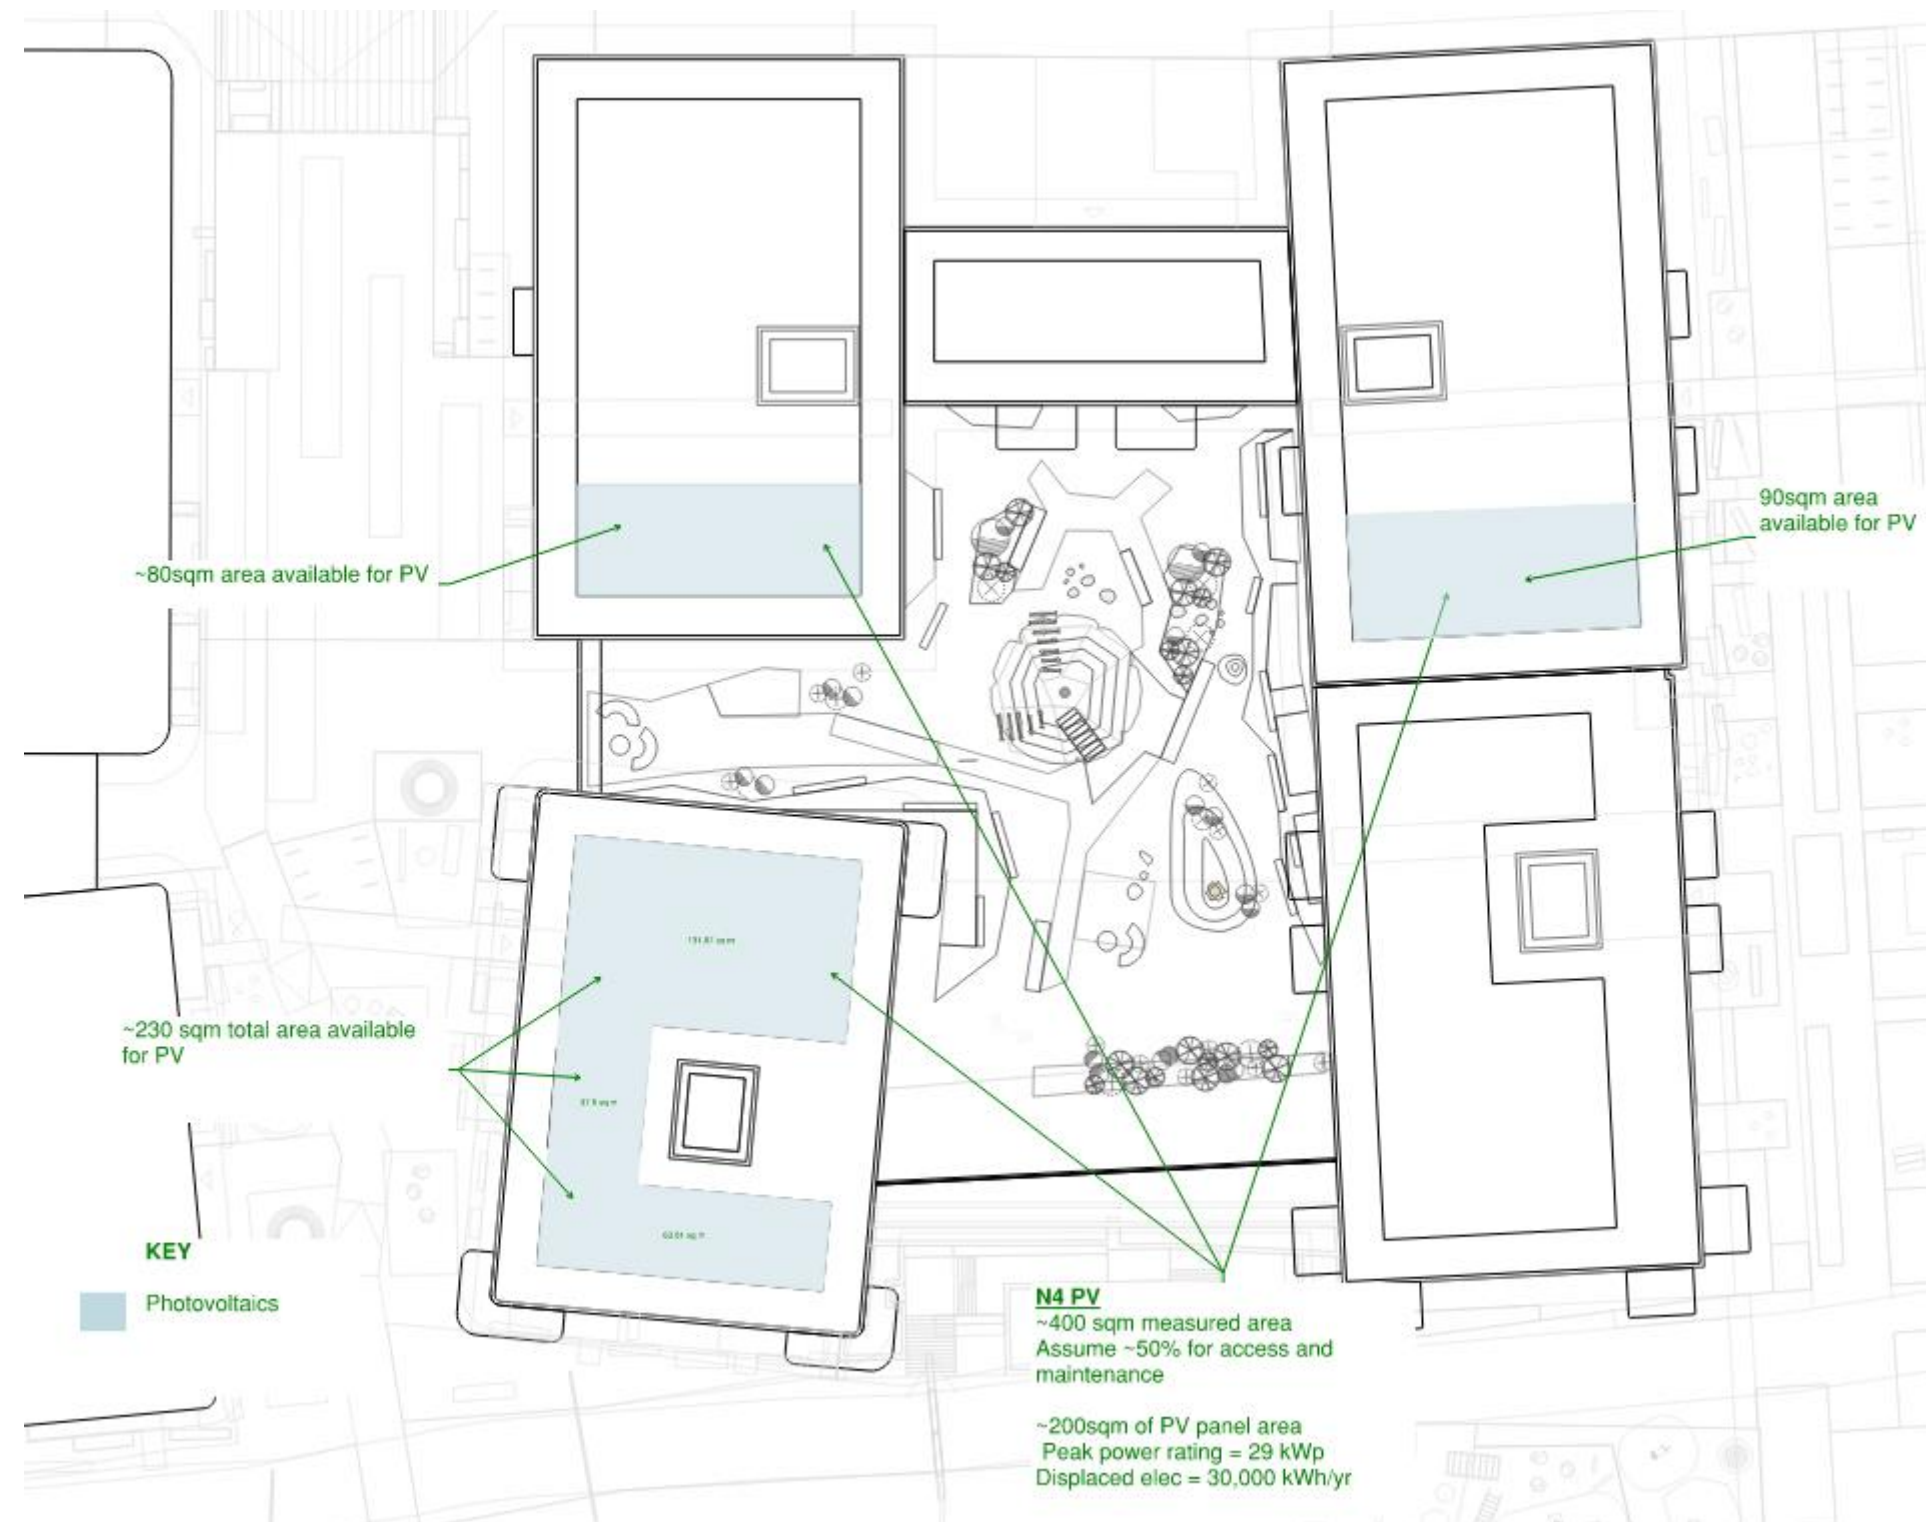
N5 - proposed area for solar photovoltaics on roof plan
